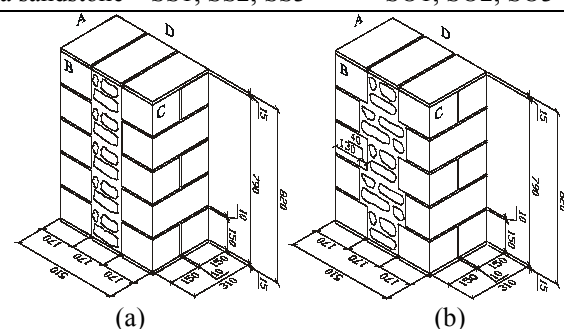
Wallets dimensions in mm: (a) straight collar joints and (b) keyed collar joints.
